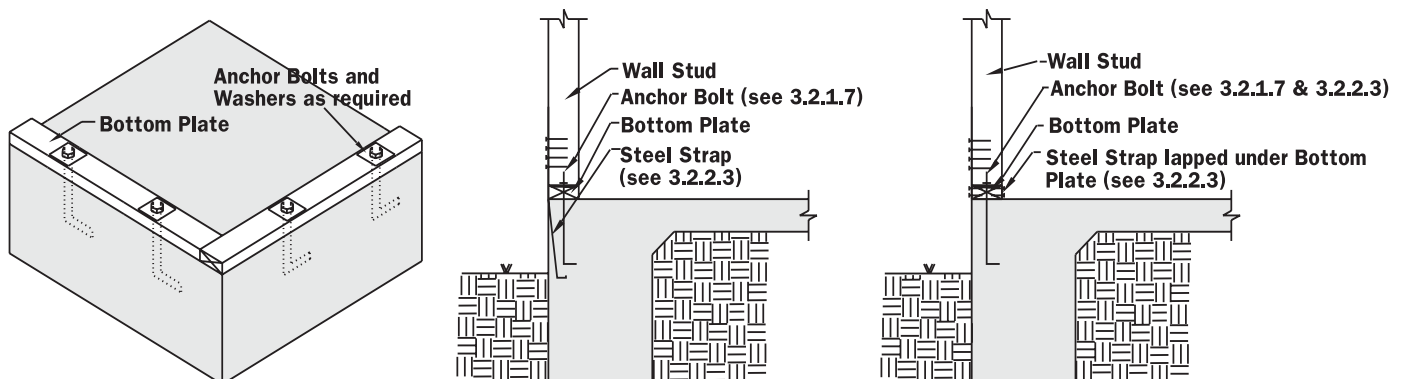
Sill Plate Anchorage to Concrete Foundation WallFigure 3.2b Sill Plate Anchorage to Masonry Foundation WallFigure 3.2c Bottom Plate Anchorage to Slab-on-Grade
